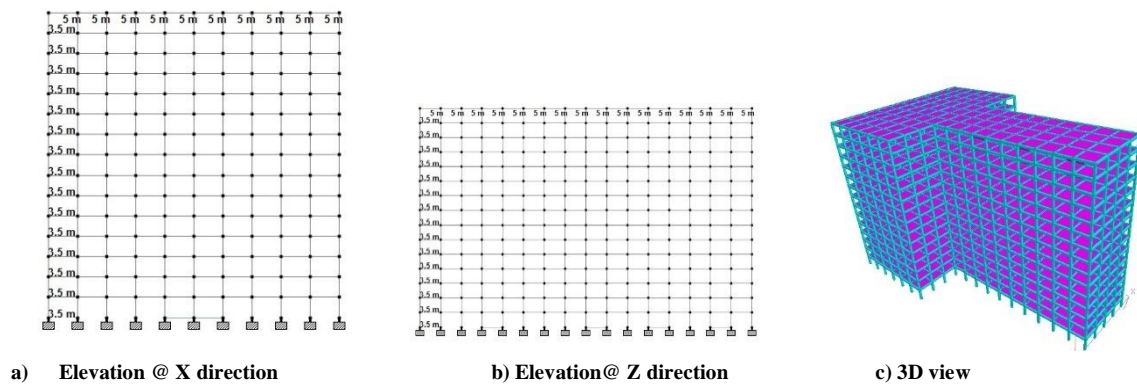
Model 4- G+14 Storey Building with T-shaped geometrical plan
